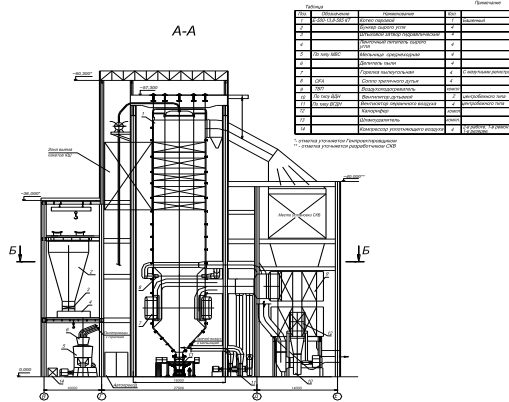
The arrangement of the PC boiler equipped with the SCR system
